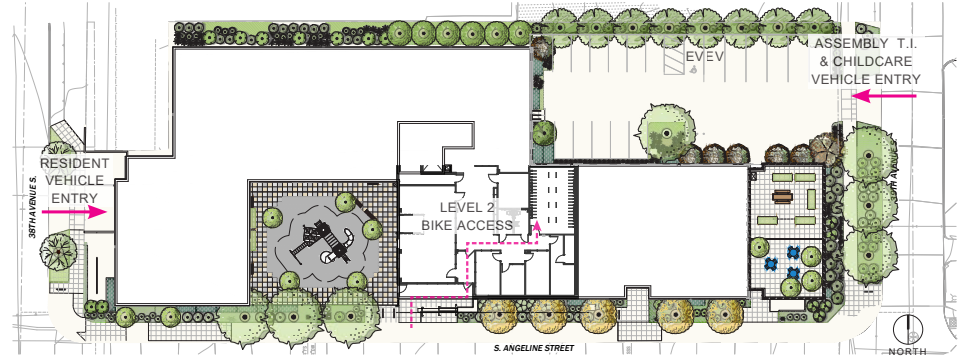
Site plan showing vehicular & bike points of entry.
